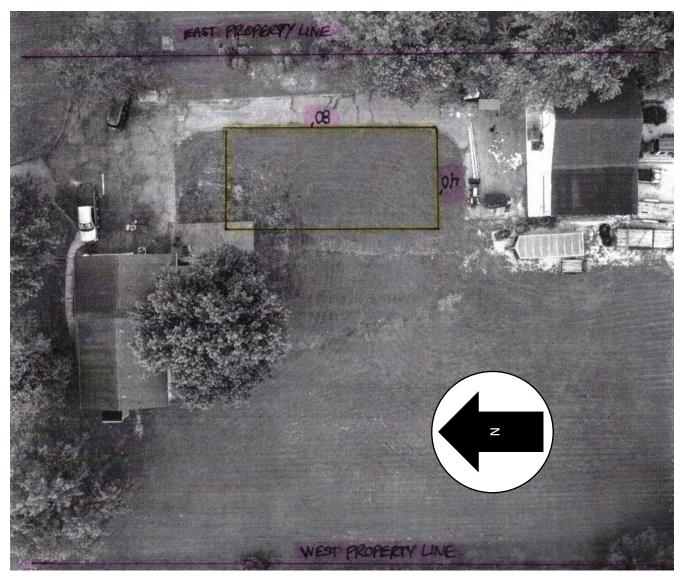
Site plan for the proposed barn at 9621 E 96th Street.
